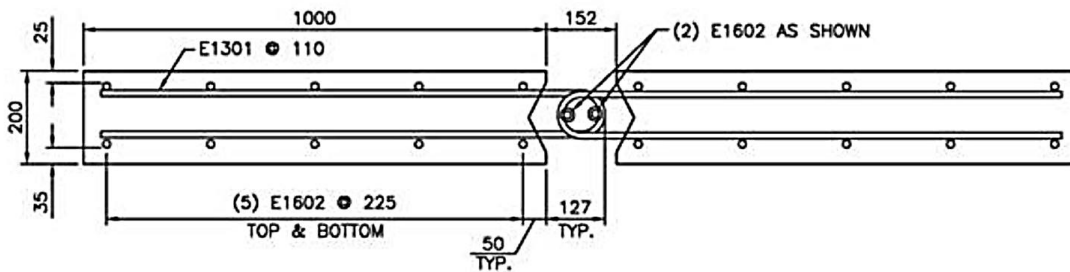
Prototype panel (pairs) for testing joint fill performance [76].
